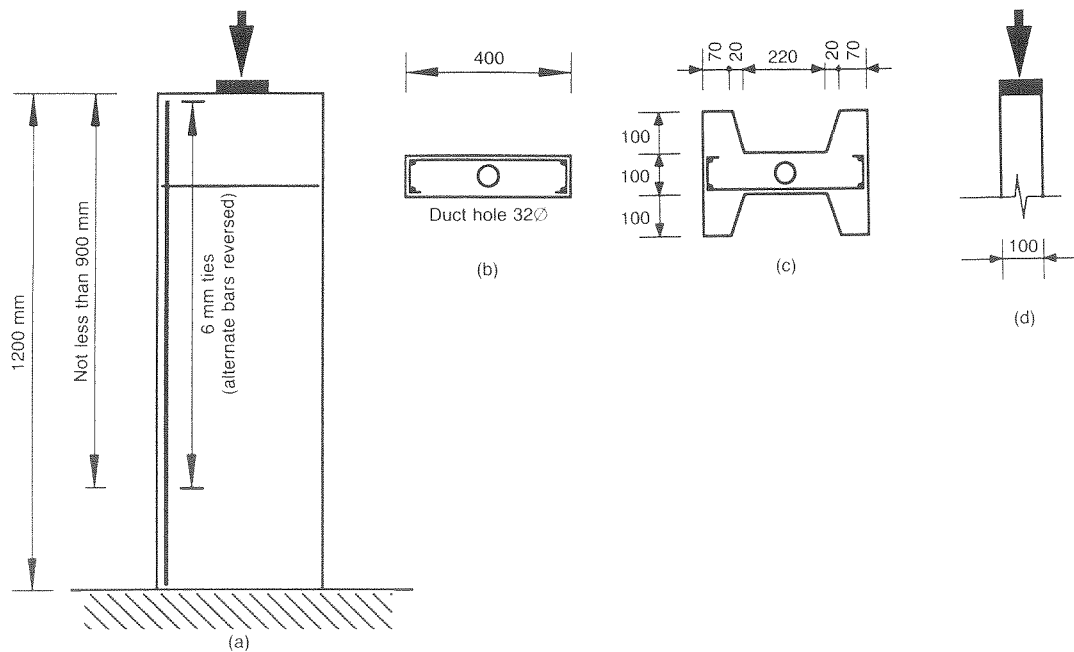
Ref. 9 test specimens, showing details of geometry, reinforcing arrangements and loading: (a) overall specimen dimensions; (b) rectangular section; (c) I-section; (d) section through loading plate
